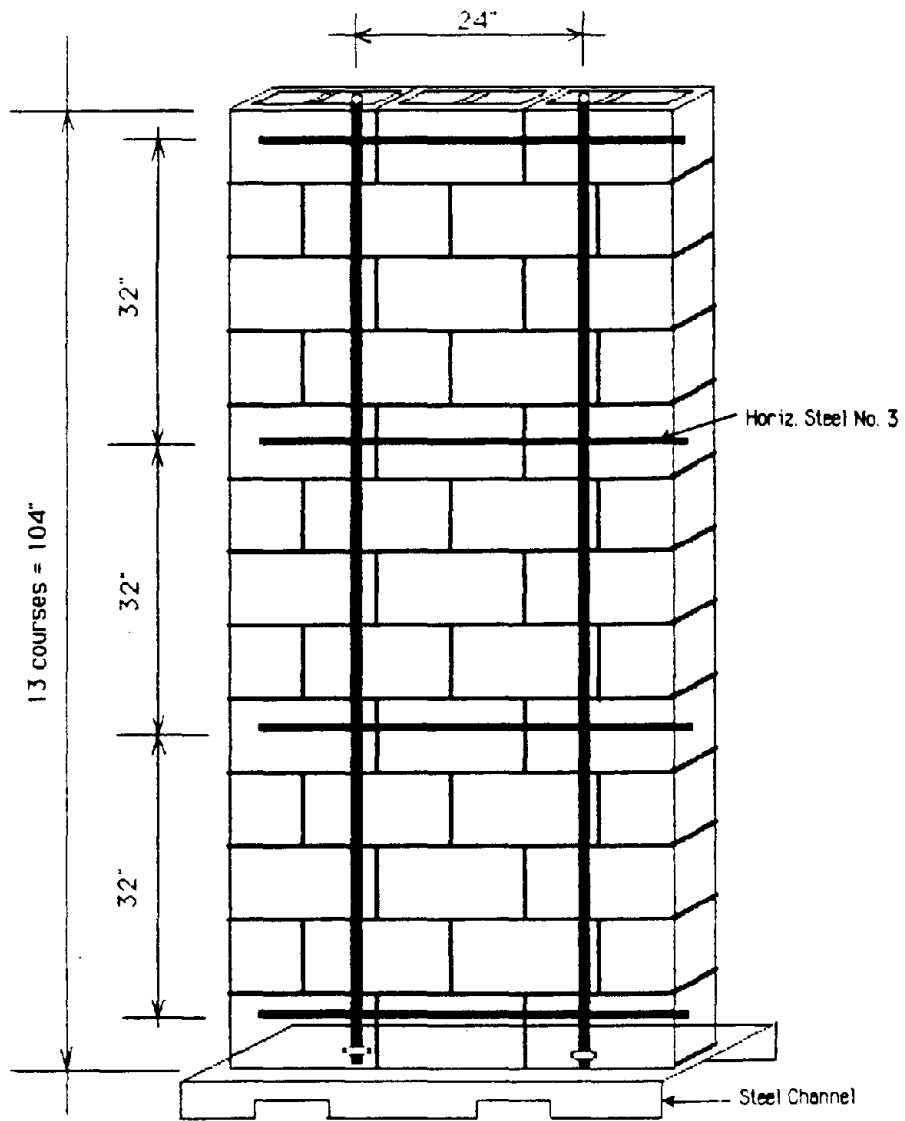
Isometric View of a Wall Panel Showing Vertical and Horizontal Steel
